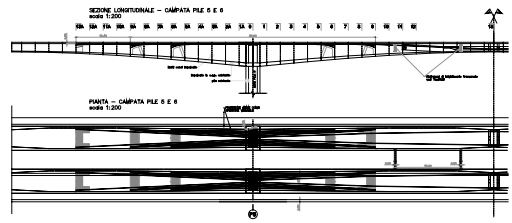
Longitudinal section and plan of the viaduct, as per the proposed new retrofit solution.
